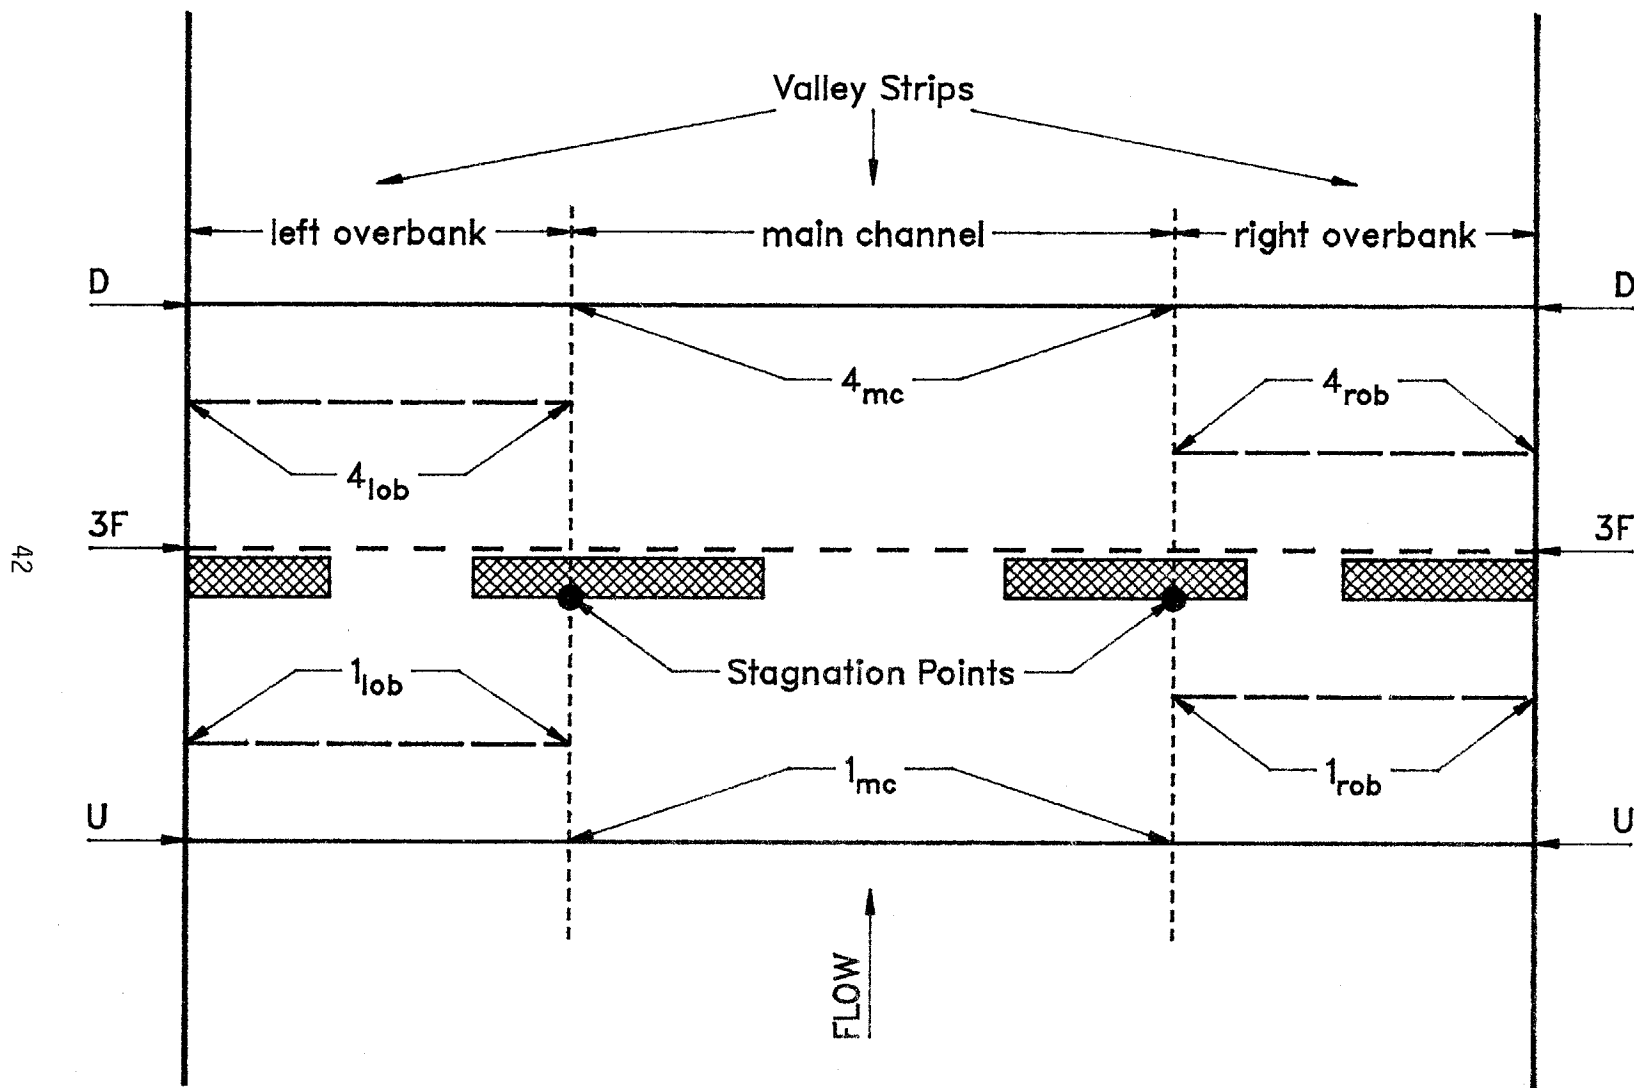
Sketch of typical multiple bridge opening situation illustrating valley strips and cross-section locations.
